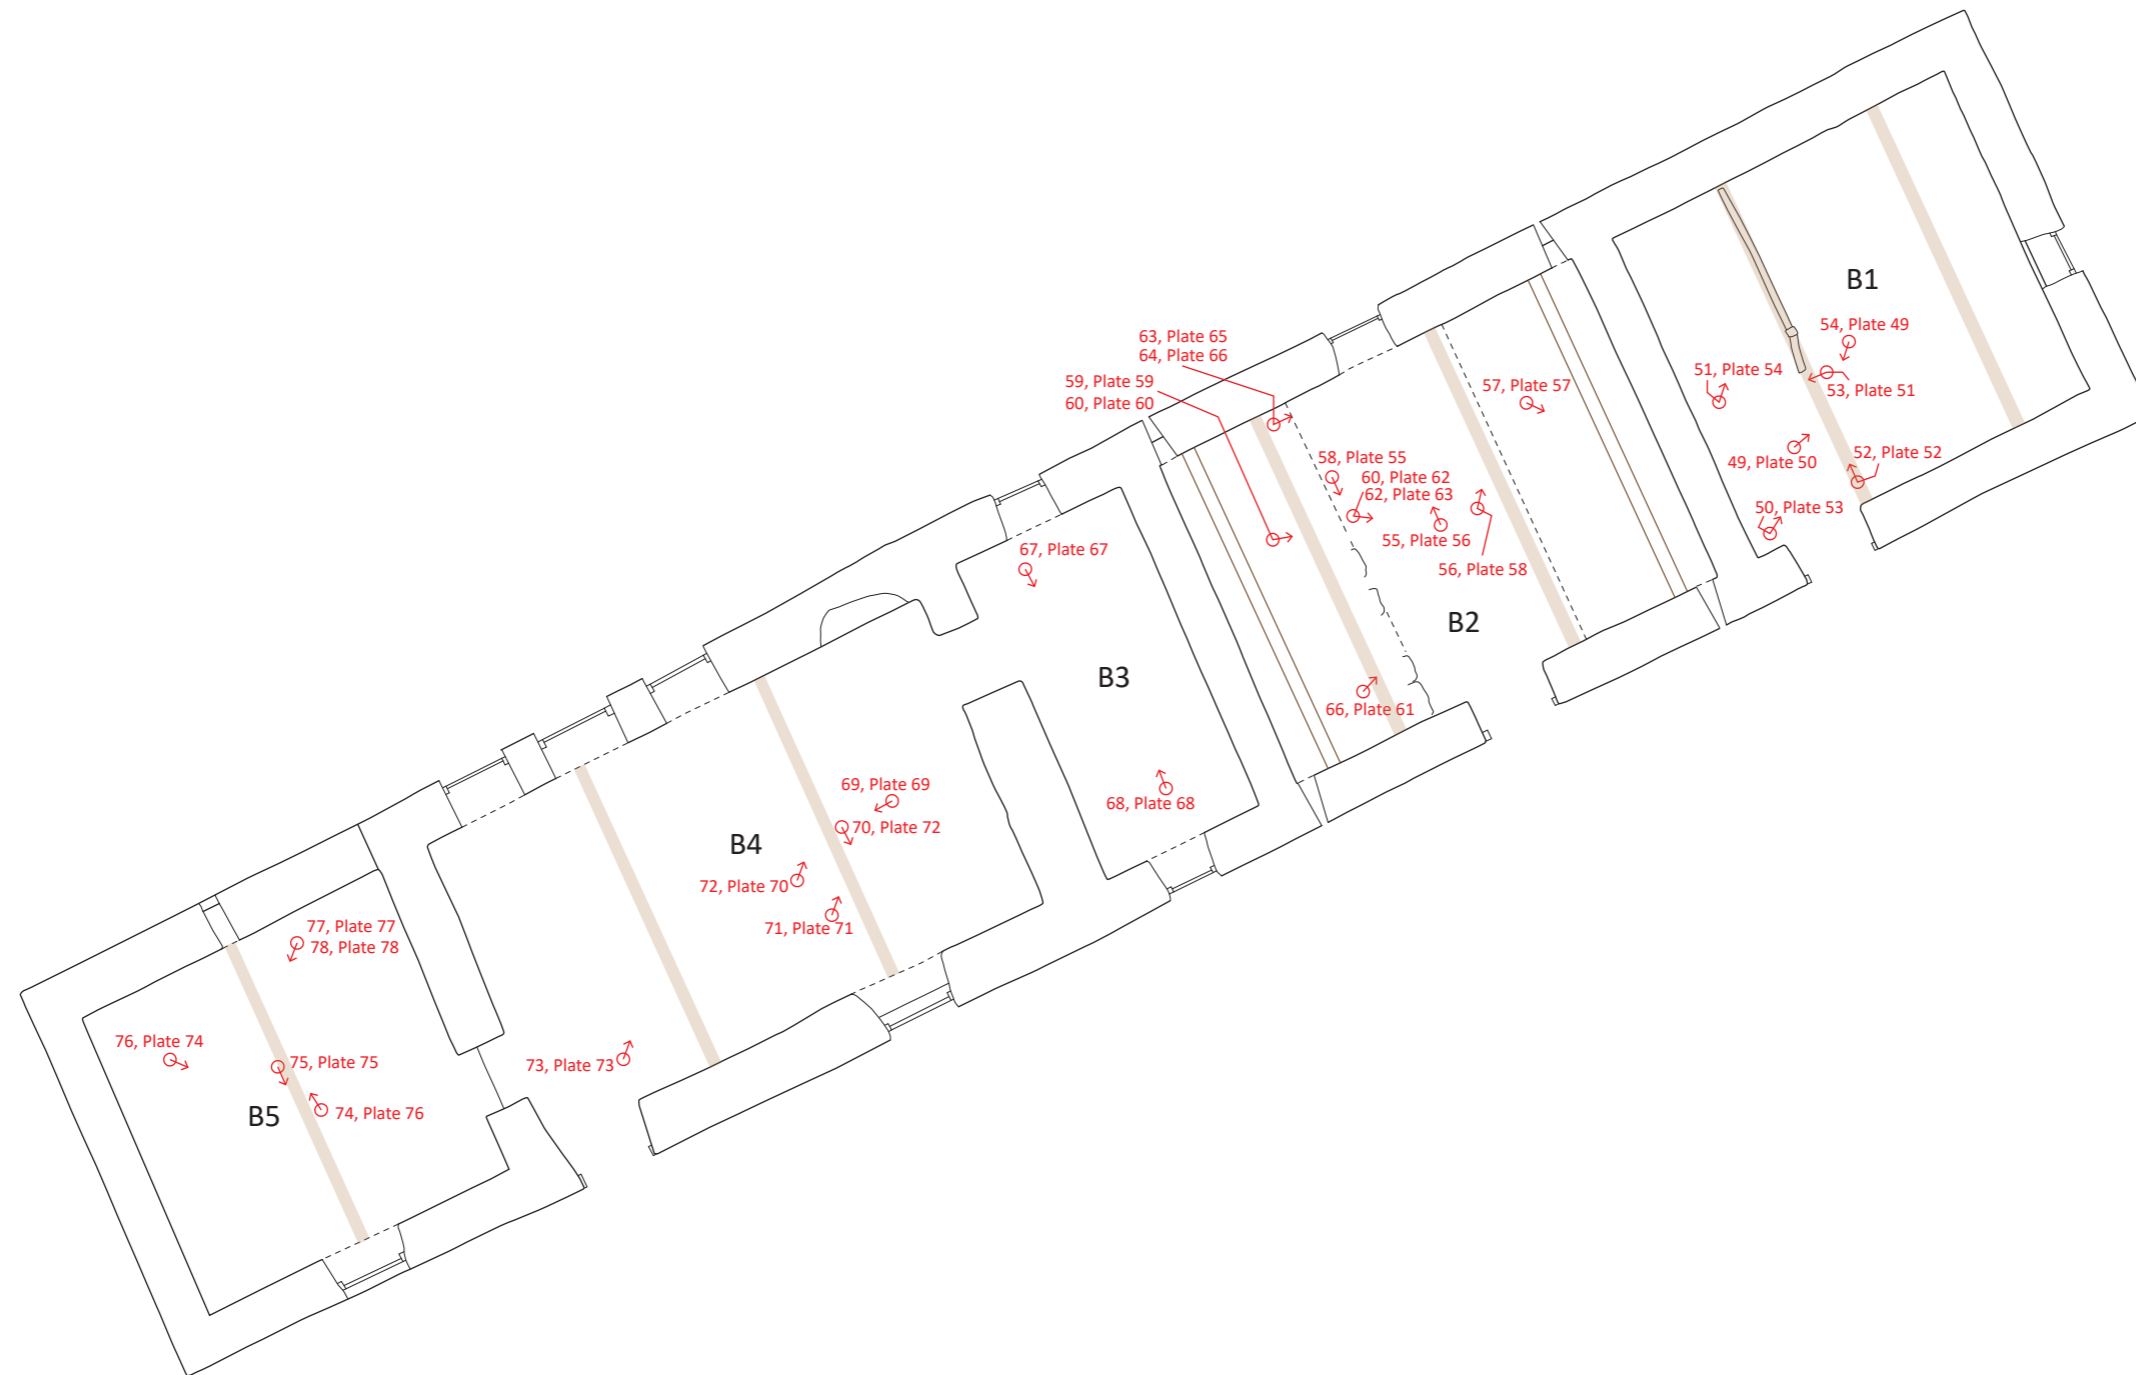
Building A (Cottage), ground floor plan showing position and direction of photographs and plates
